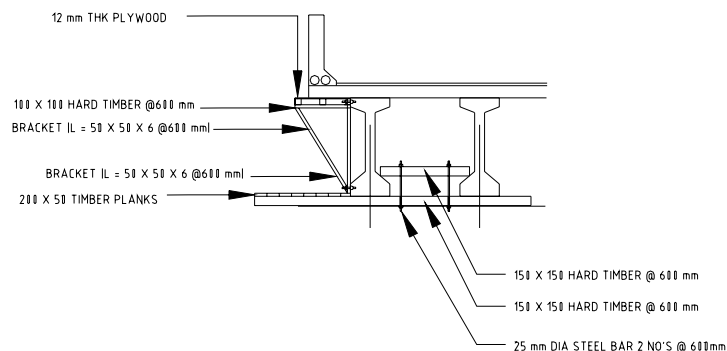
Steel Bracket Type for Cantilever Slab
